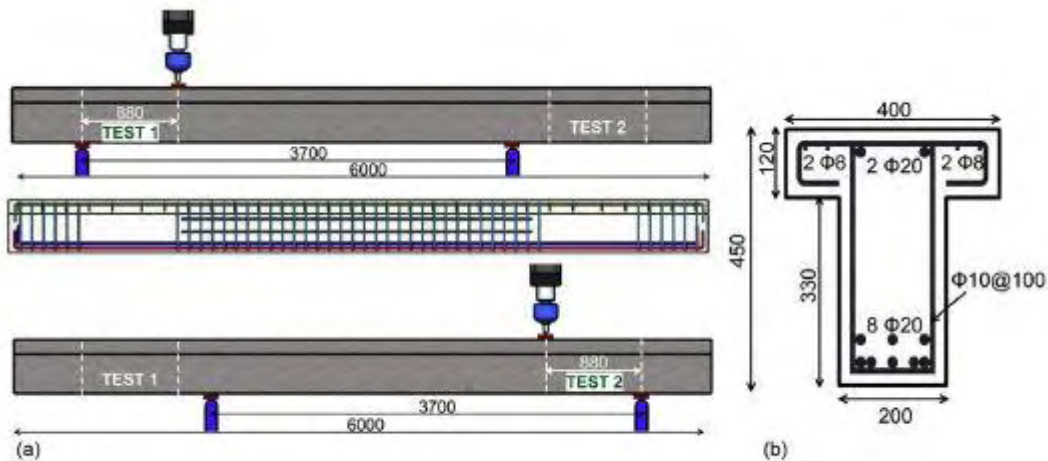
(a) Schematic test set-up; (b) cross-section (dimensions in mm).
